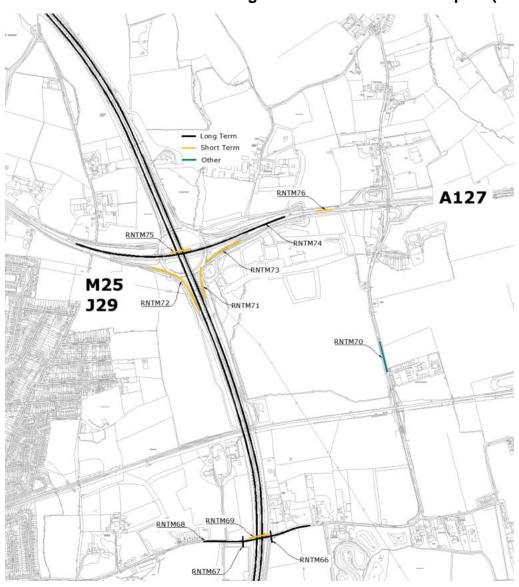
Roads North traffic management measures location plan (7 of 7)
